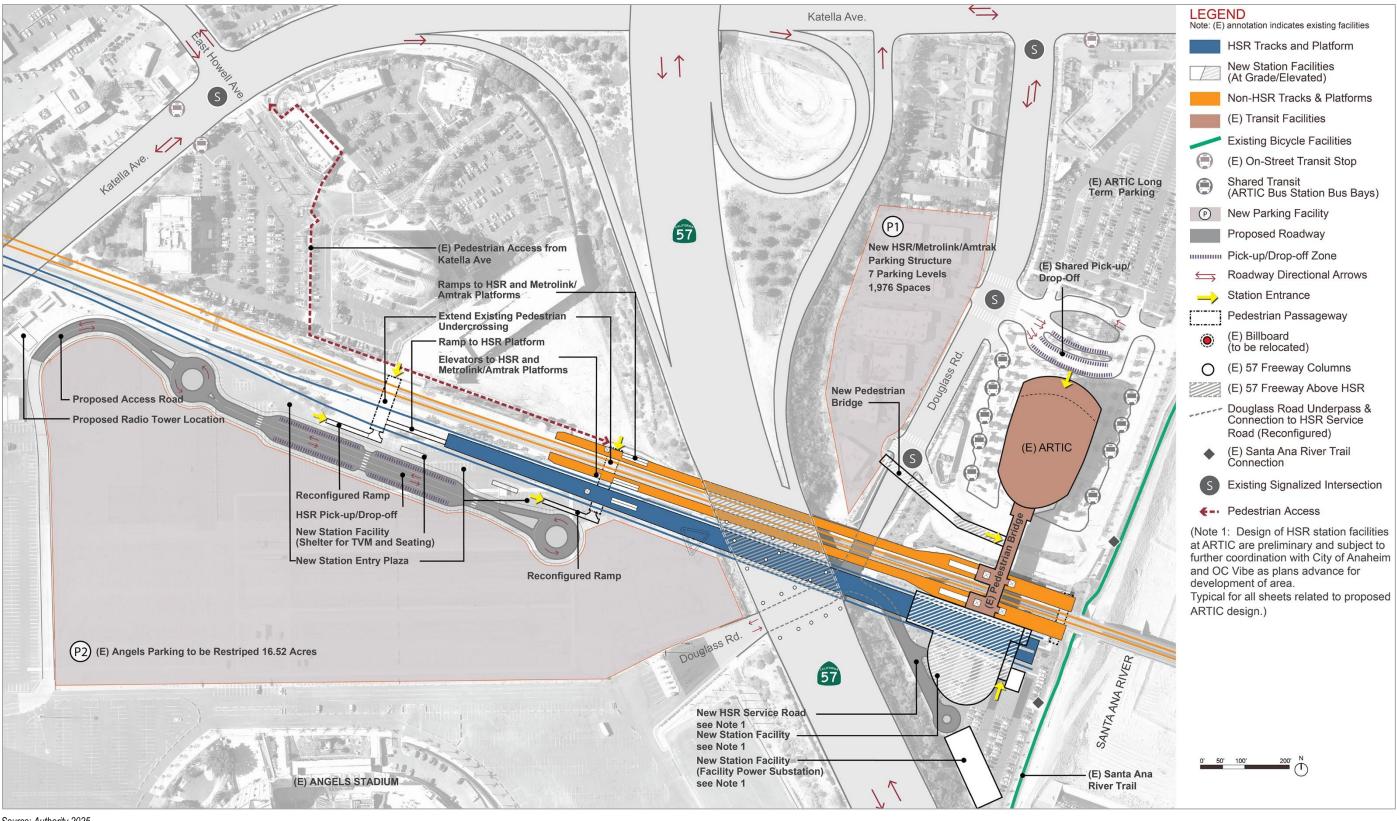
High-Speed Rail Platform and Facilities at ARTIC
